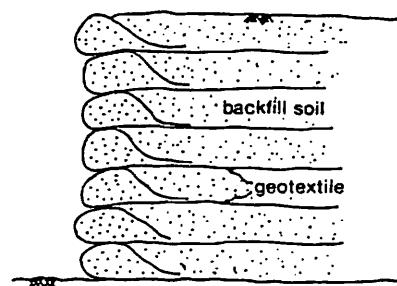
Typical wrapped-around geosynthetic-reinforced soil retaining wall.
